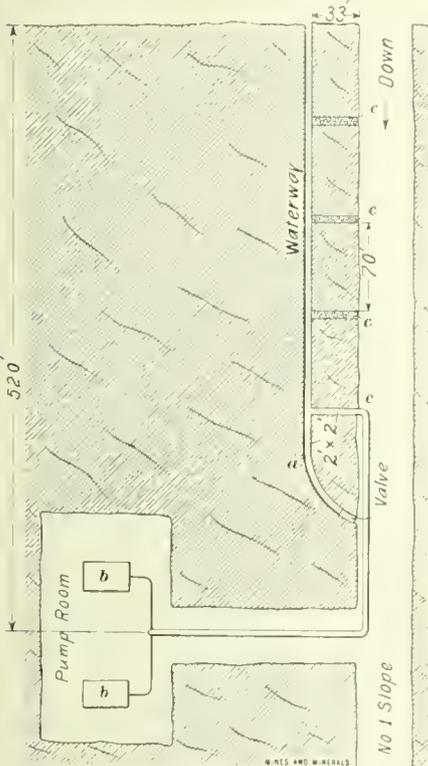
PLAN OF PUMPING ARRANGEMENT
